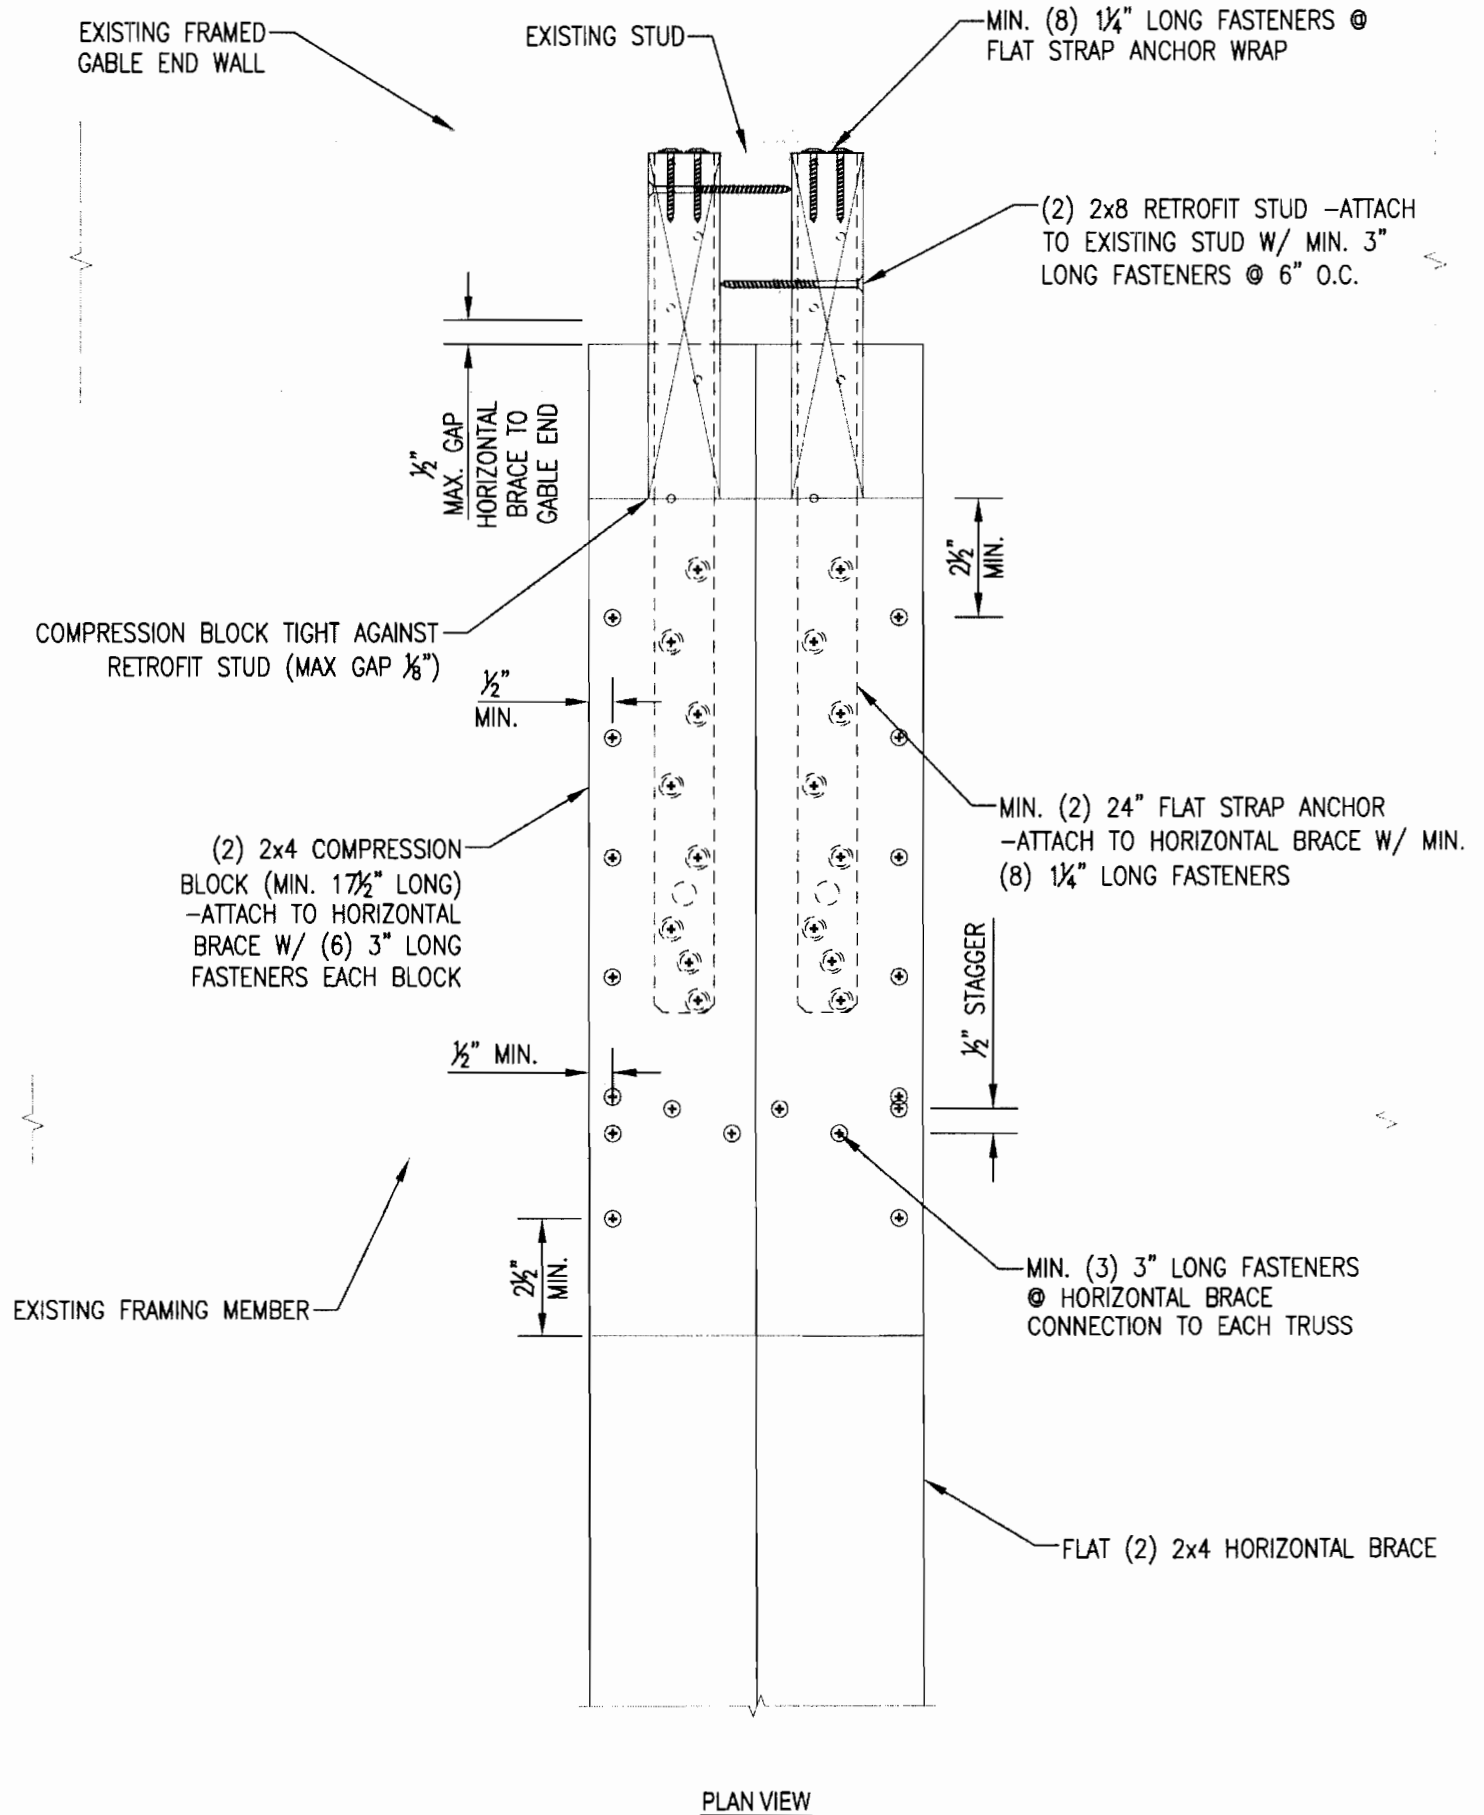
DETAILS OF STRAP & COMPRESSION BLOCK INSTALLATION - (2)2x8 RETROFIT STUD
